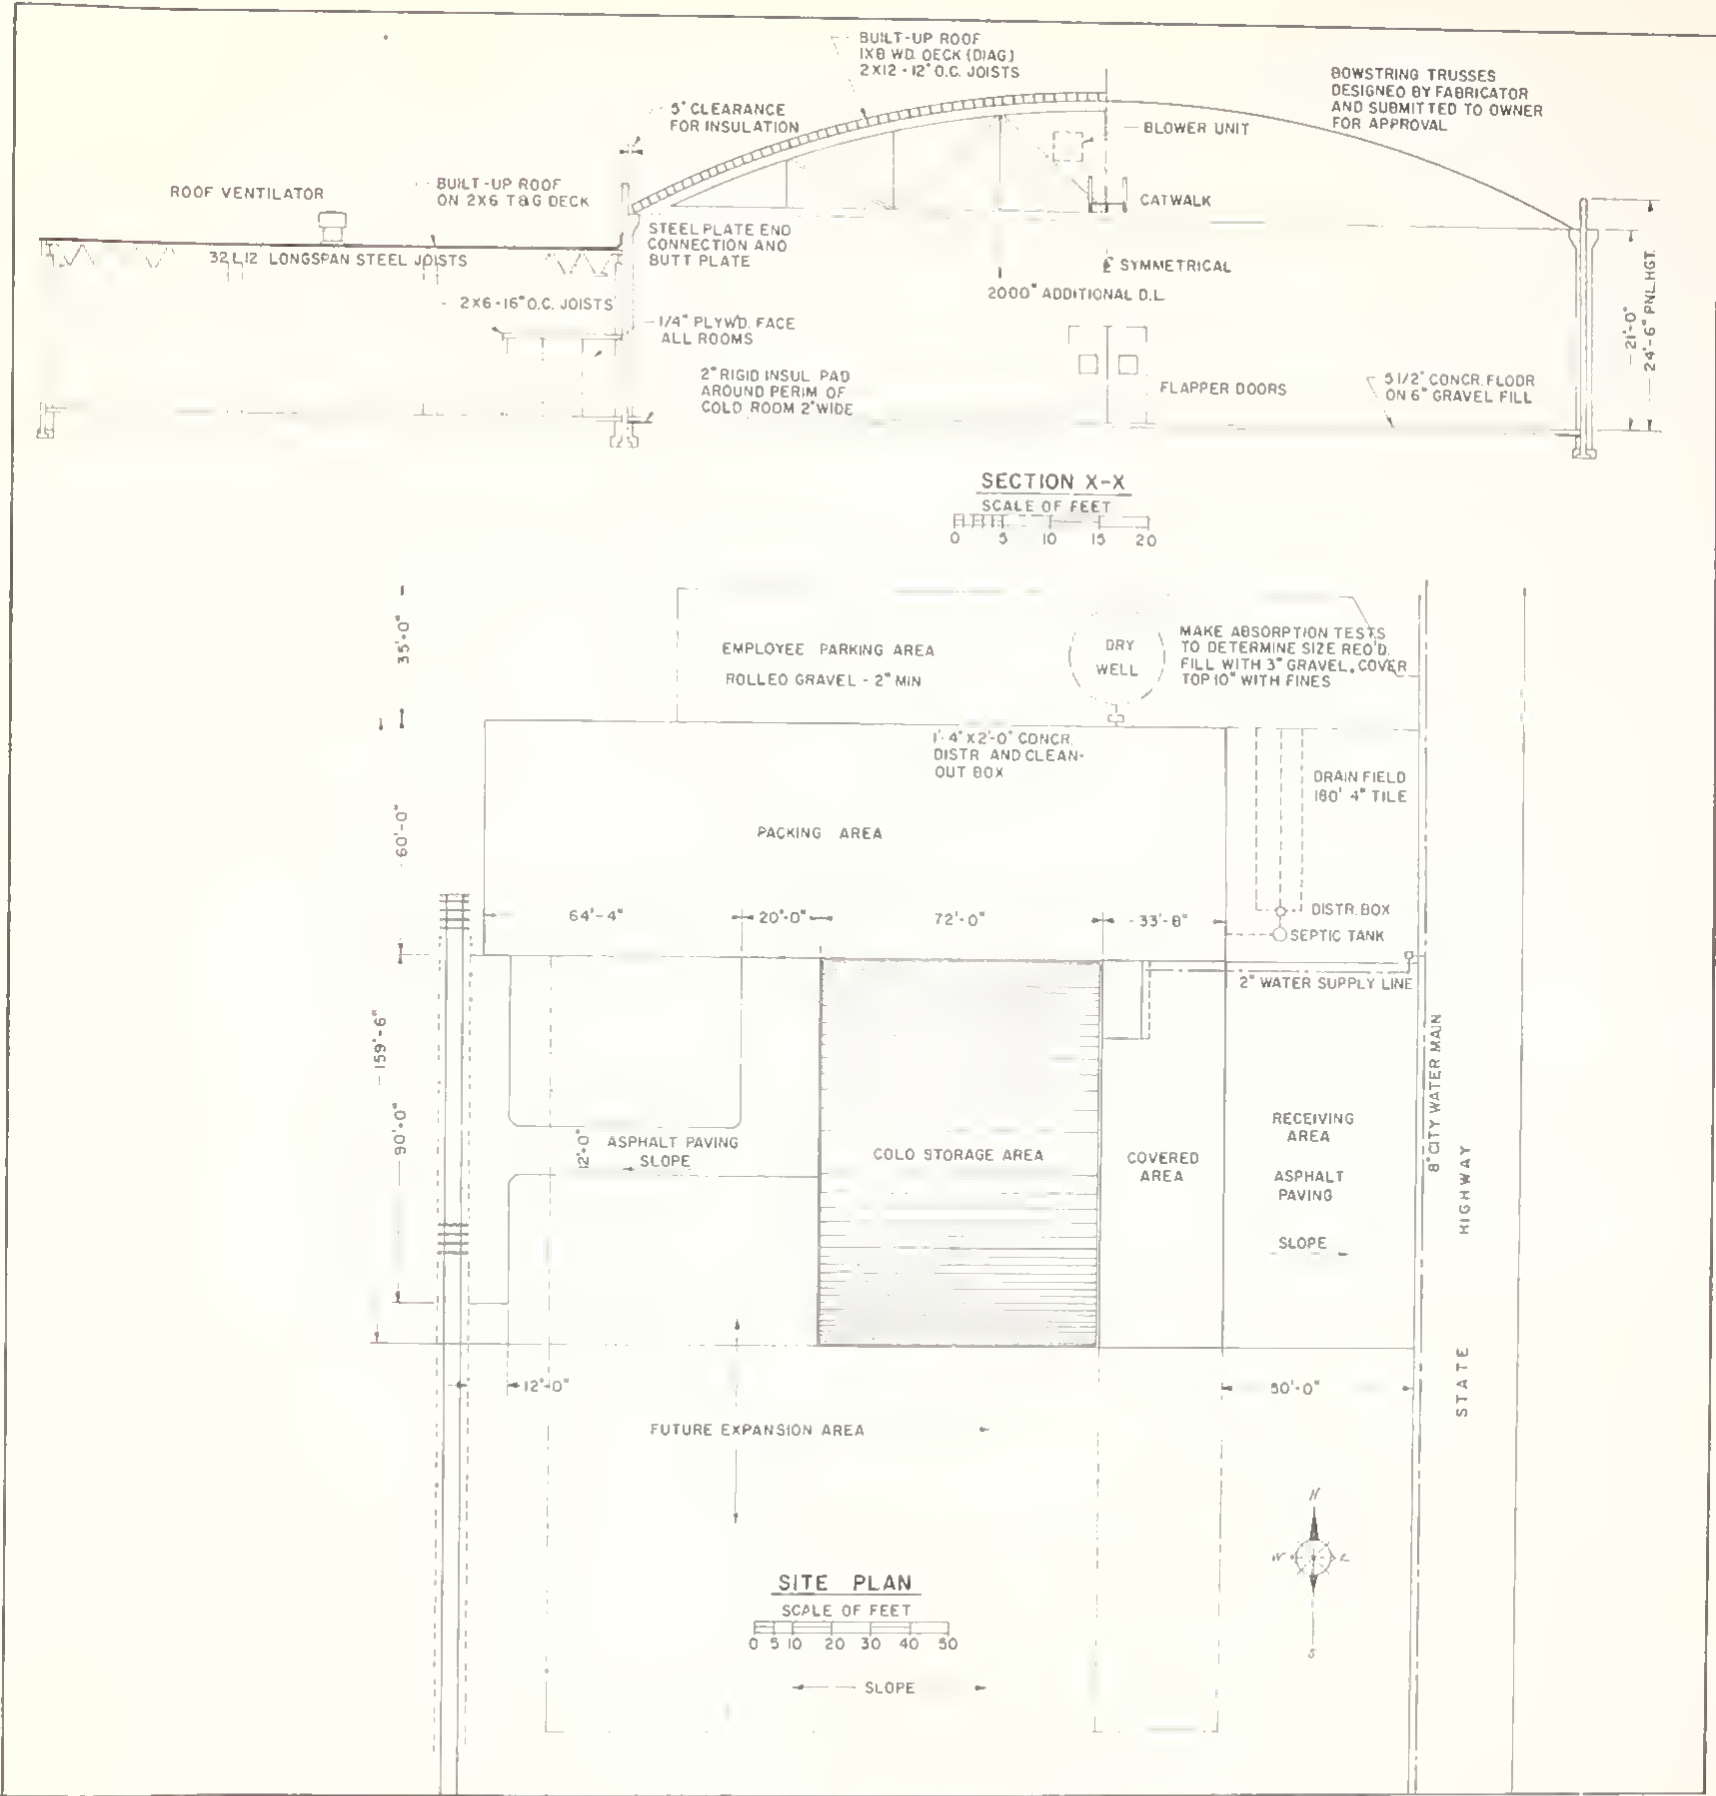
Site plan for the 50,000-box-capacity apple packing and storage house.
